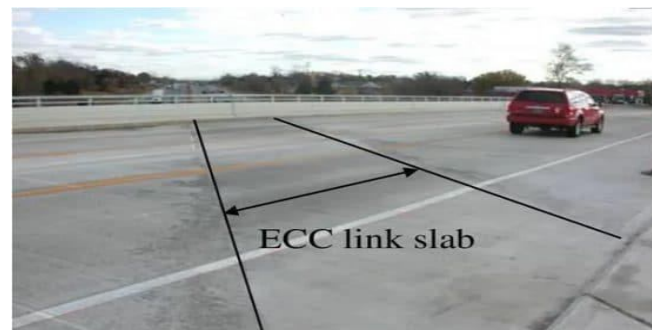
Fig. ECC link slab, which replaced a conventional expansion joint on a Michigan bridge deck, has lasted over a decade without repair or maintenance
